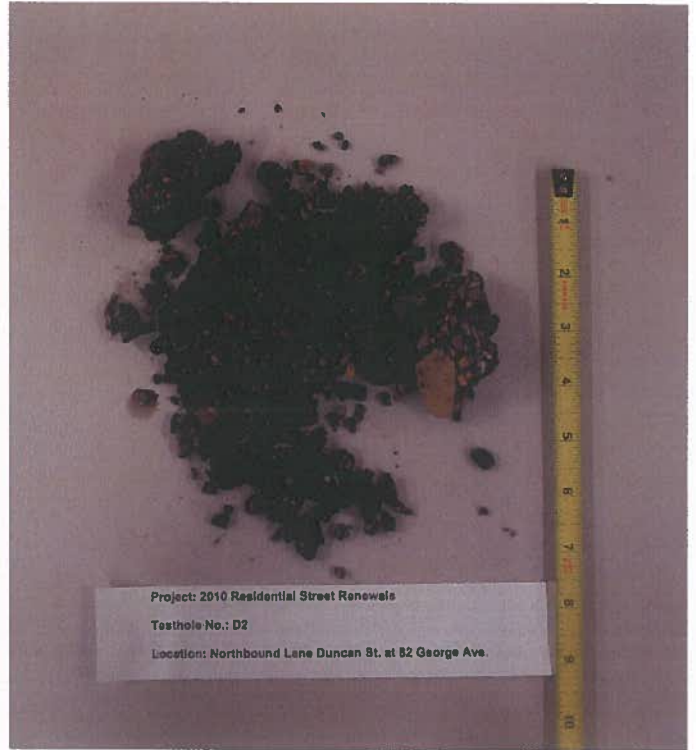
Test Hole D2: Duncan St. Northbound Lane, 30m S of S sidewalk at George Ave., 1.9m W of E curb
